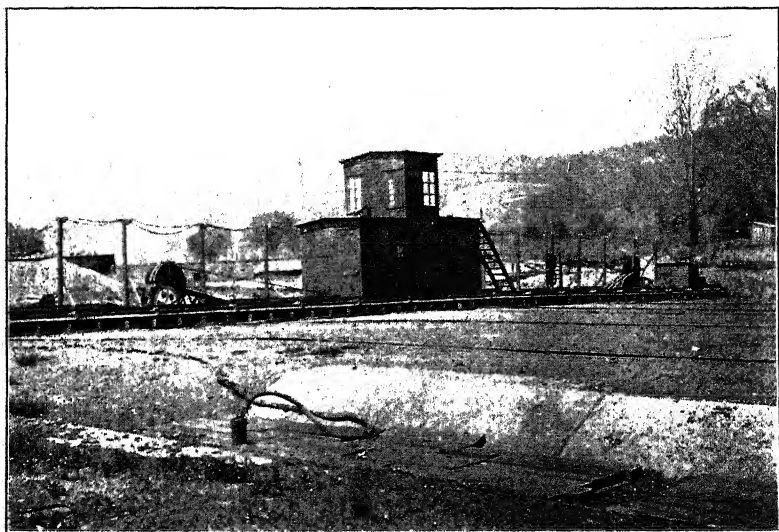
RANSOM PLANT. TRAVERSING-RELOADER, SHOWING ELECTRICAL CONNECTION, AND HOPPER-SLOT PLANK AND COVERING OF LONGITUDINAL TUNNEL.
